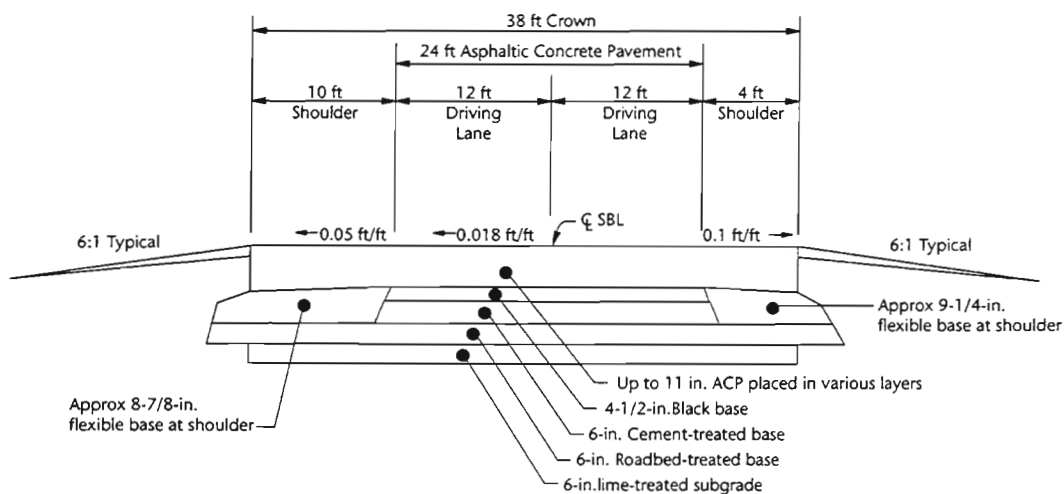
Existing typical cross section in flexible test sites (1 ft=0.304 m, 1 in.=2.54 cm)
